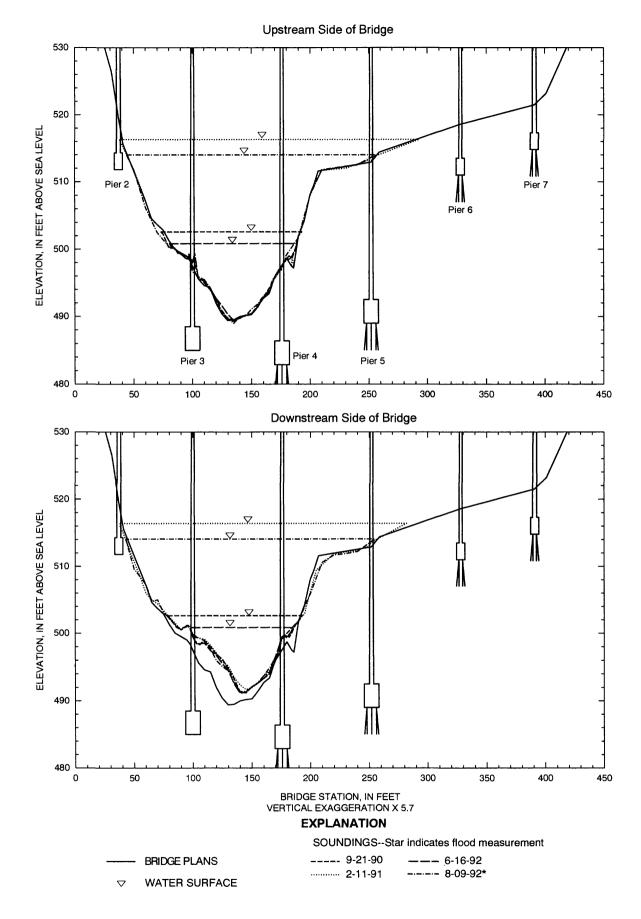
Cross sections showing bed elevations from bridge plans and soundings, State Road 135 over Muscatatuck River at Millport, Indiana.
